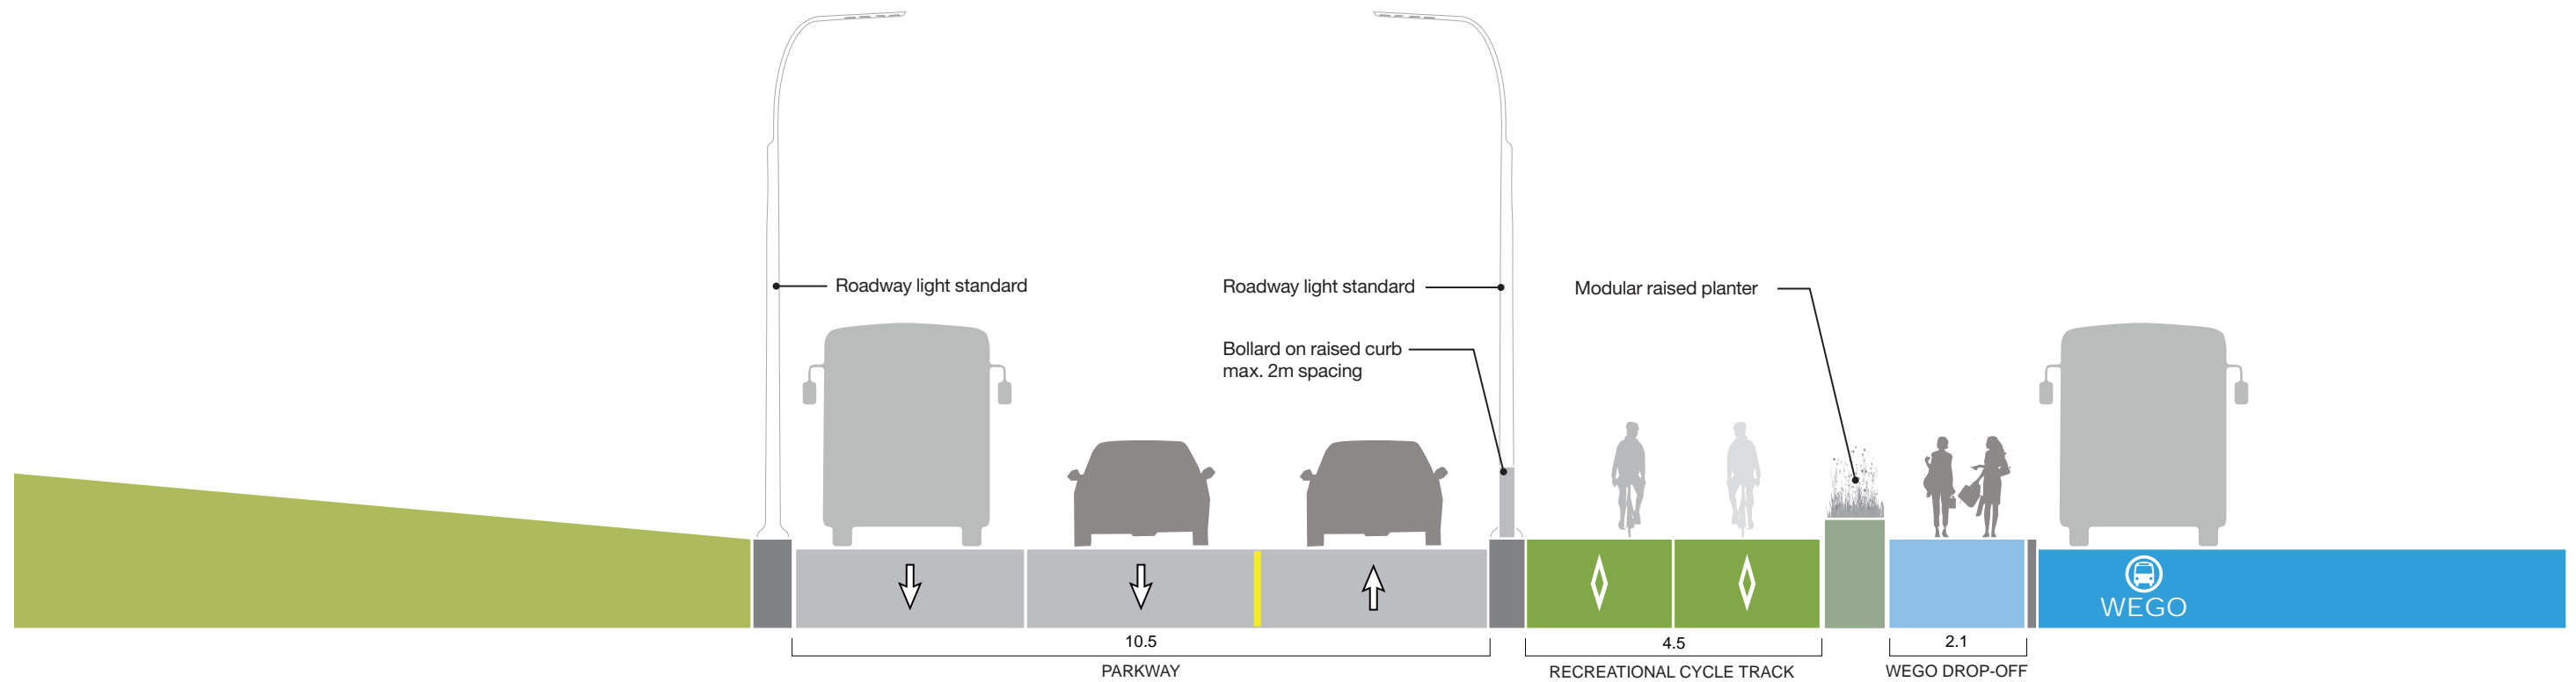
Parkway Section C2: Transit Hub - looking northward
